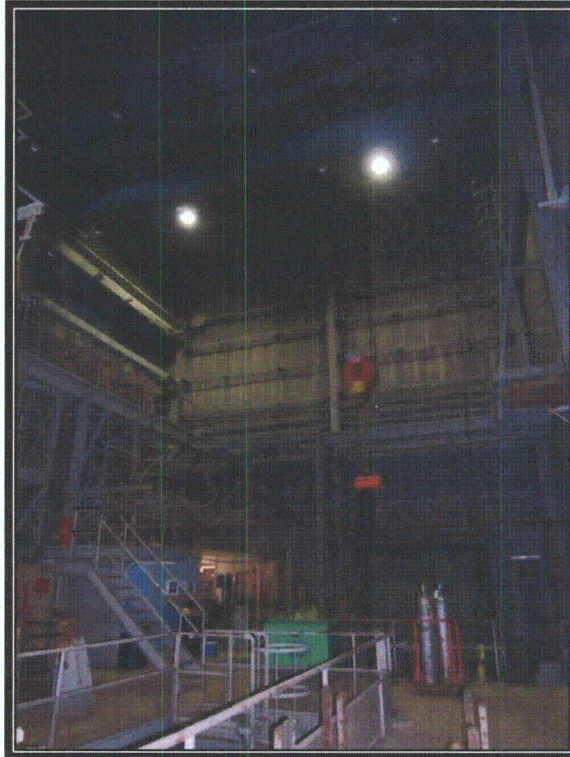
East wall of steam generator building showing overhead crane (Photograph by RCG&A, 2008)
